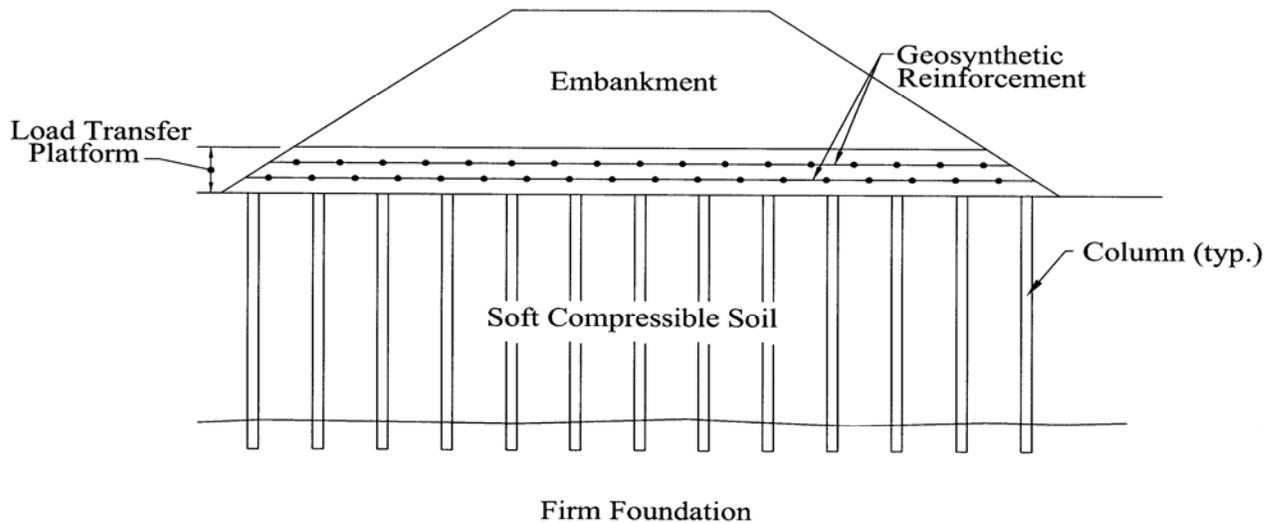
Column supported embankment with a geosynthetic reinforced load transfer platform
